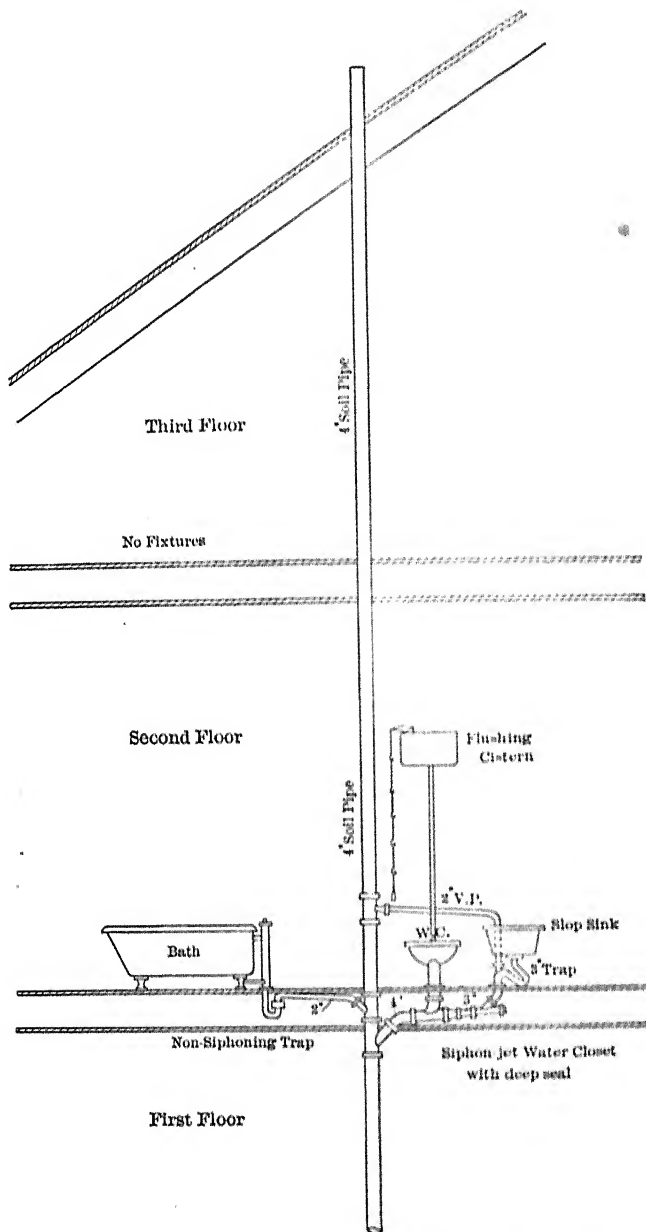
Section of House Showing Original Arrangement of Plumbing.
